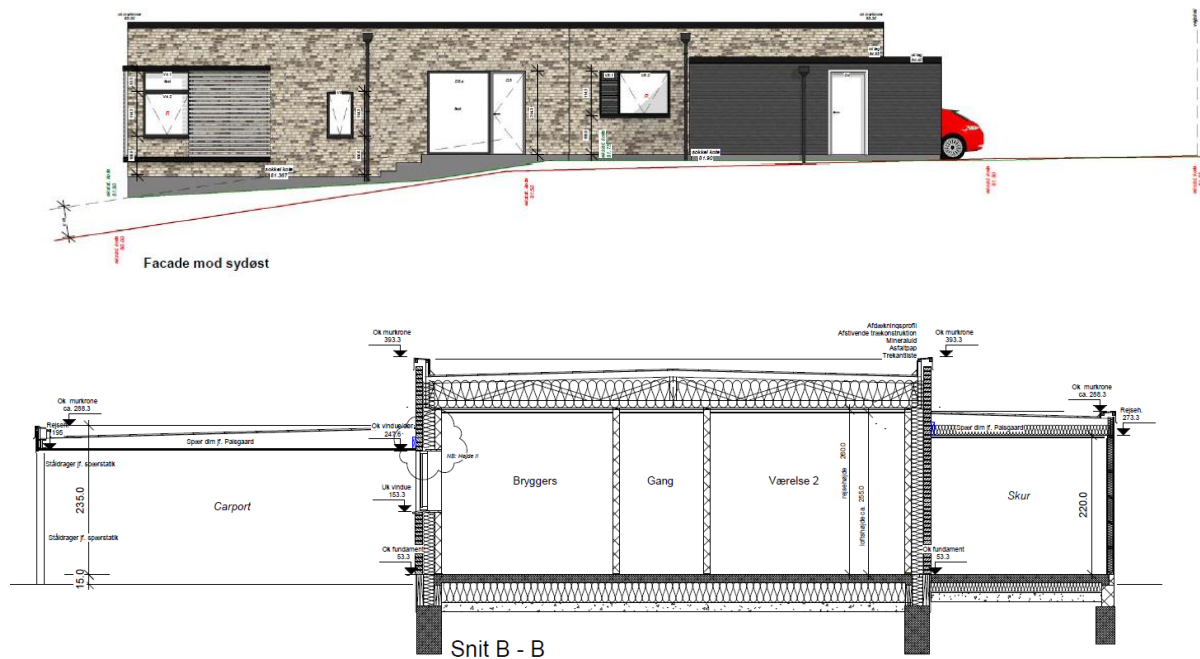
South-east building elevation and section B-B (Lasse Larsen Byggefirma 2017).
